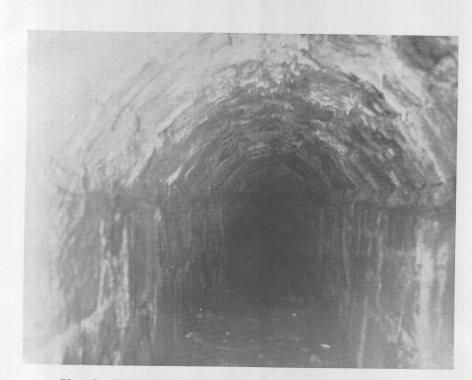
Plate I.—VIEW DOWN THE TUNNEL AT N.-E. OF TINWALD HOUSE COTTAGES.
